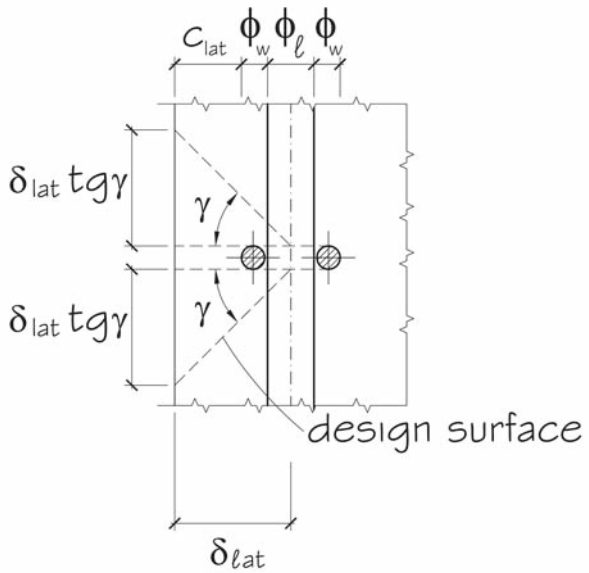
Transversal section of the detail in Fig. 16.18
